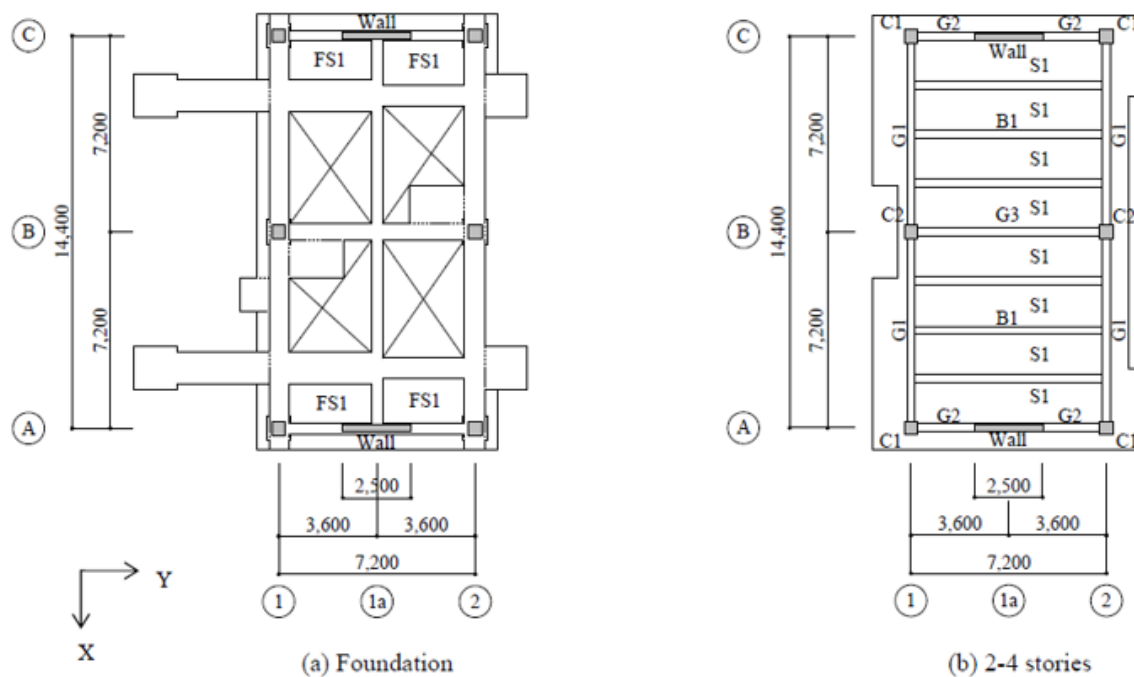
Plan of four-story RC building on the NIED E-Defense shake table [30].
